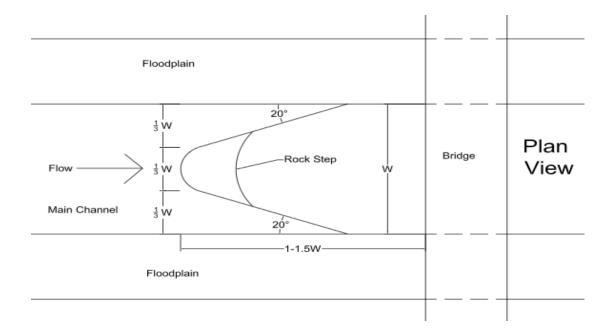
Plan View for Implementing a Cross-Vane Near Bridges.
